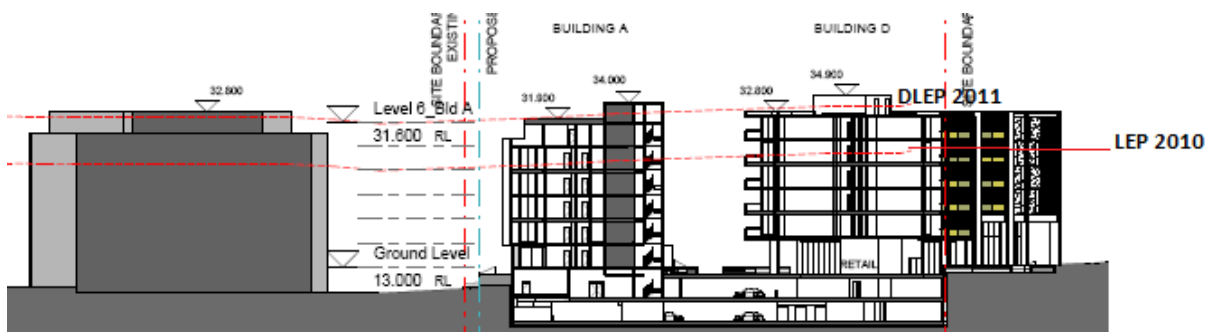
Section 4 showing Buildings A and D height in comparison to the Bay One development located opposite.
